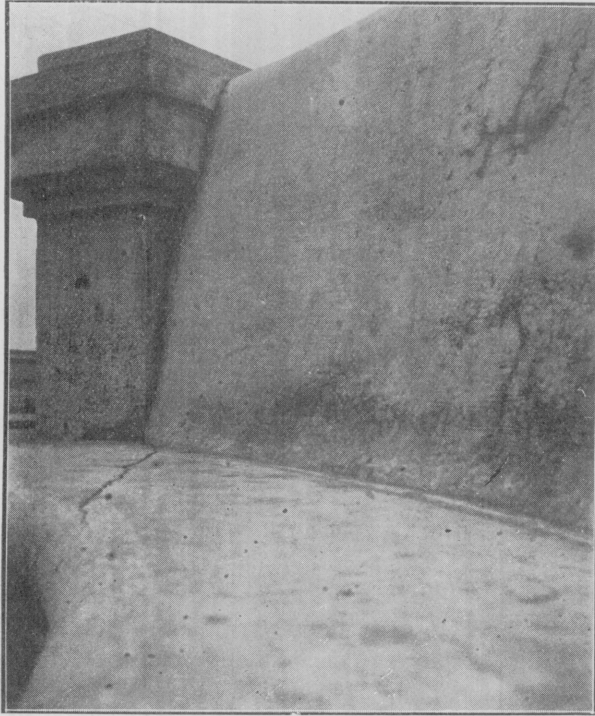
Parapet of the Y Bridge at Zanesville, Ohio, Showing Hair Cracks and Surface Corrosion.
